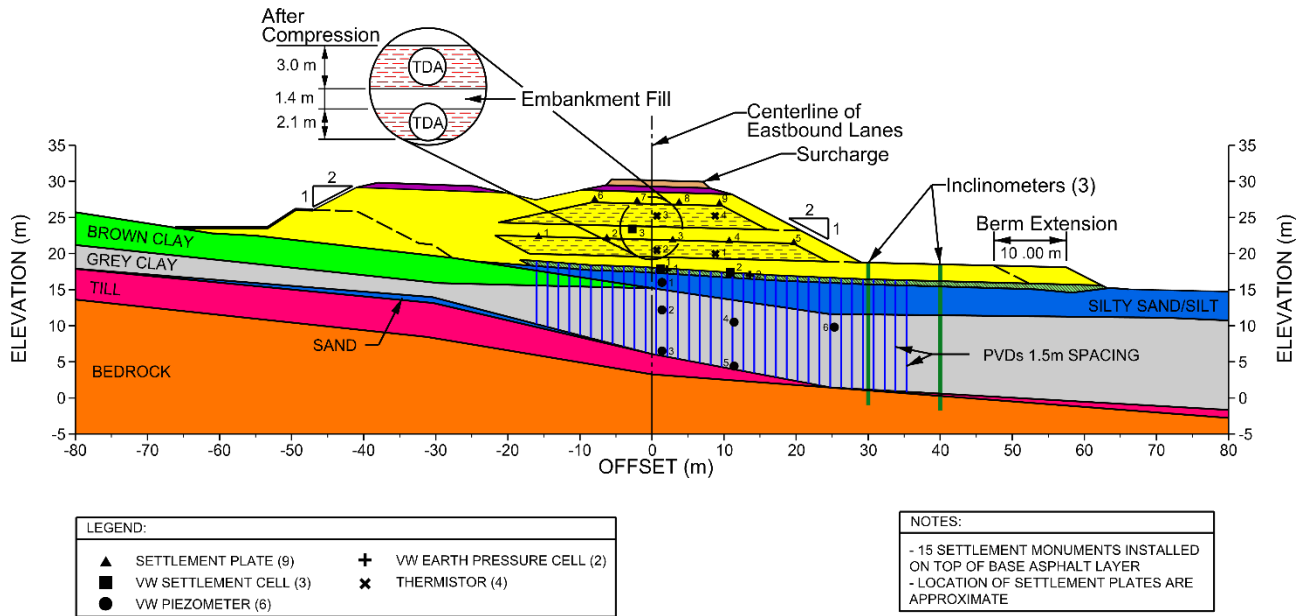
As-Built Cross Section Through Centre of Original Failure Showing Instrumentation
